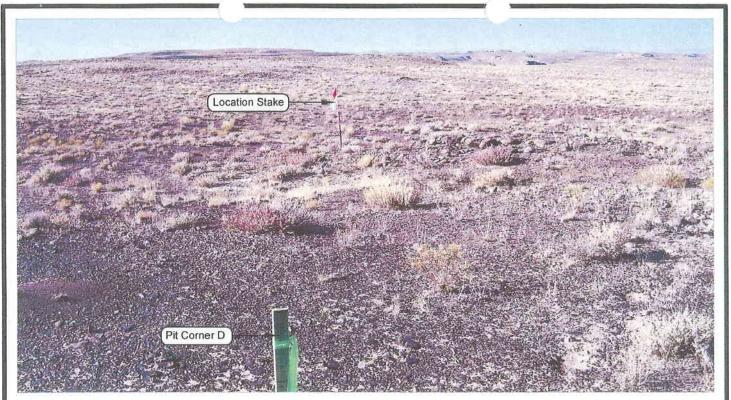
PHOTO VIEW: FROM PIT CORNER D TO LOCATION STAKE
